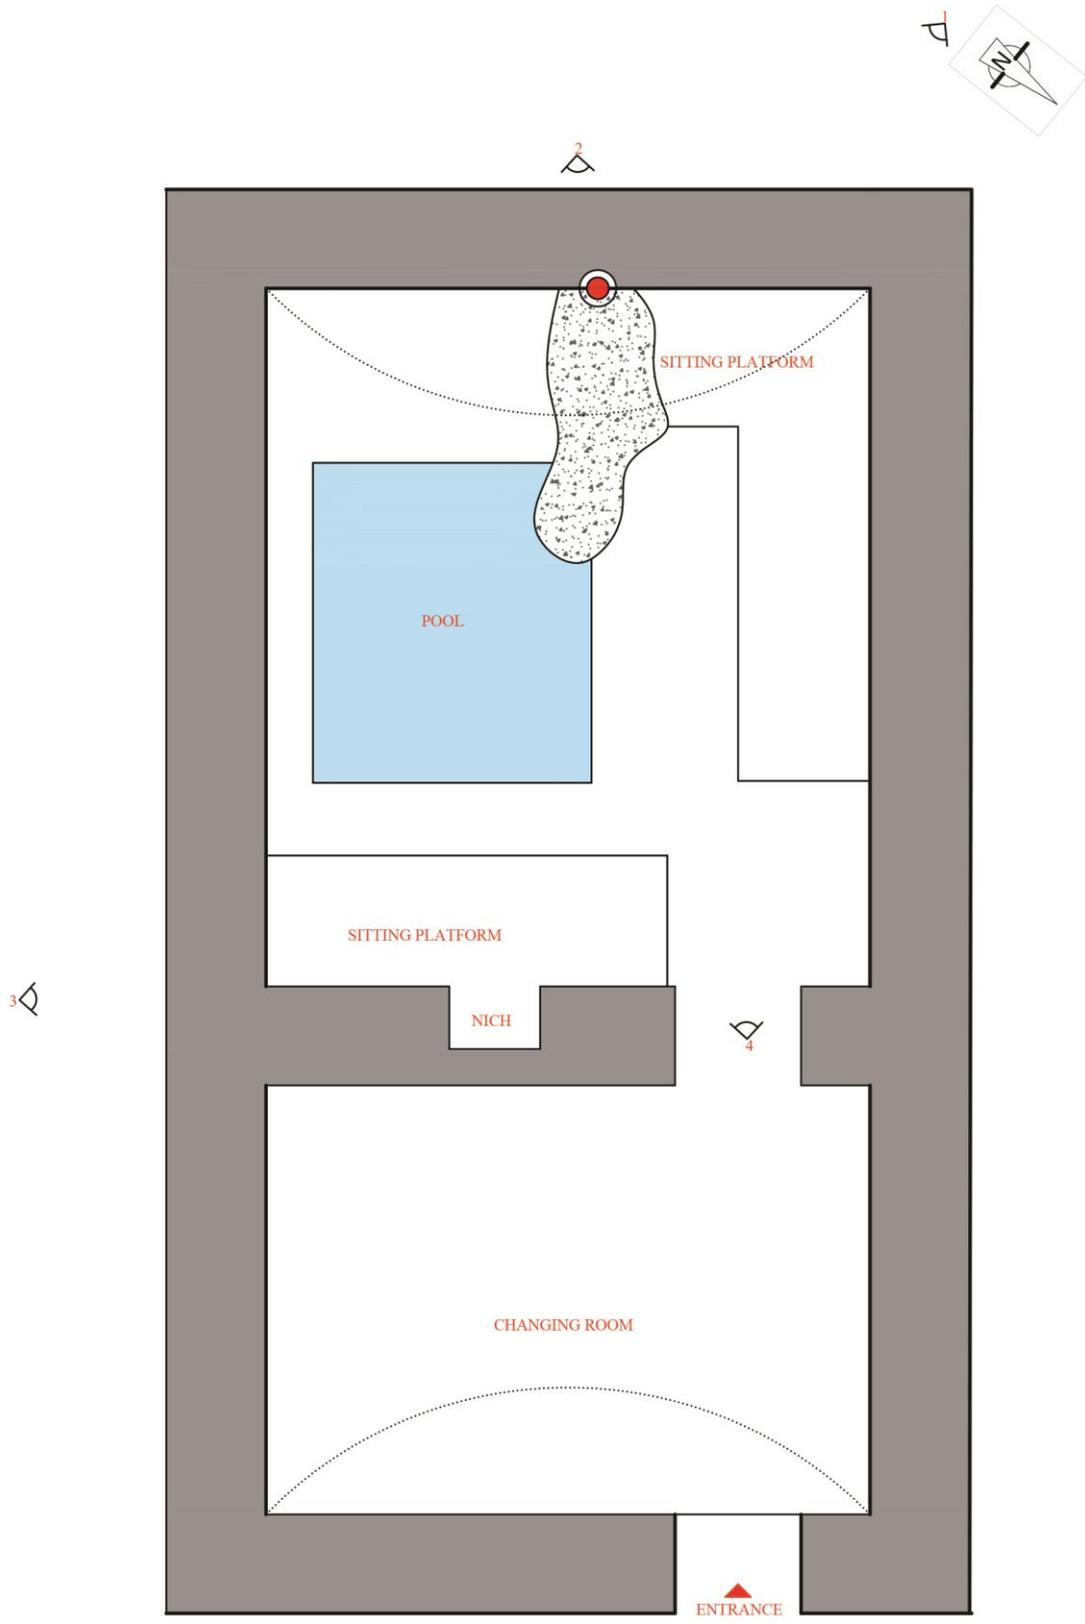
Cumalı Thermal Spring Bath Houses, A and B, Plan Scheme
